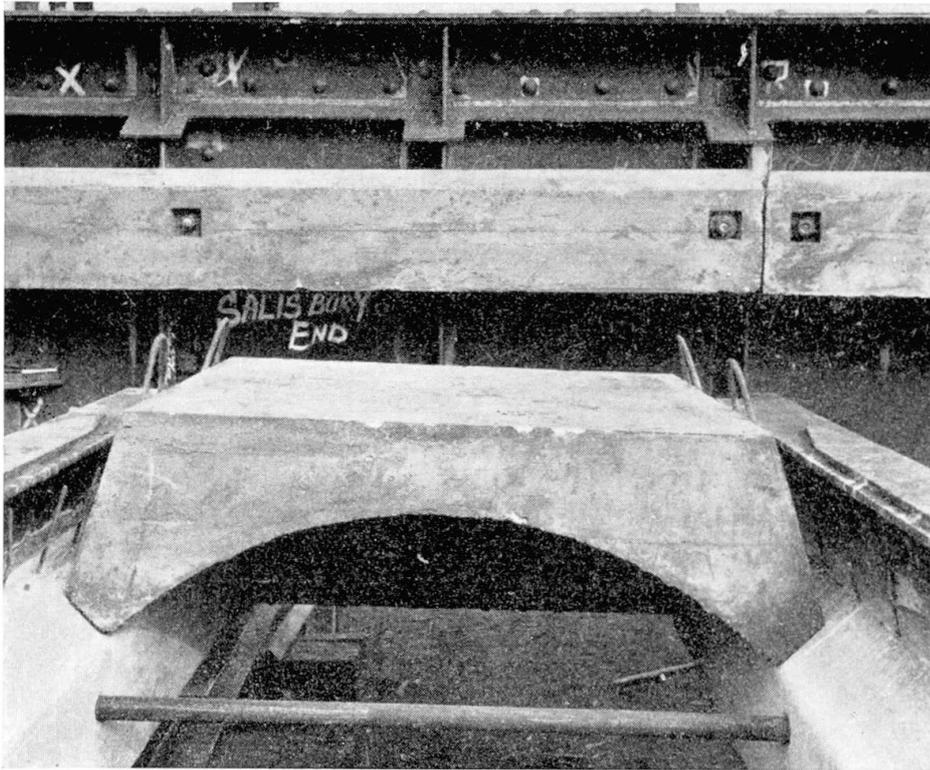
A precast reinforced concrete jack arch resting on the concrete skewbacks precast on the bottom flanges of the cross girders
